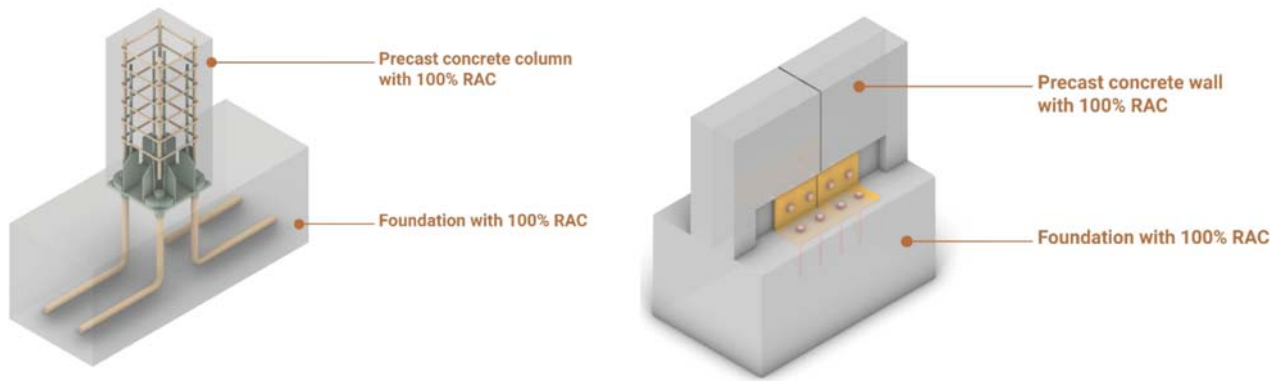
Connection of precast concrete column and foundation (left), and precast concrete wall and foundation (right)
